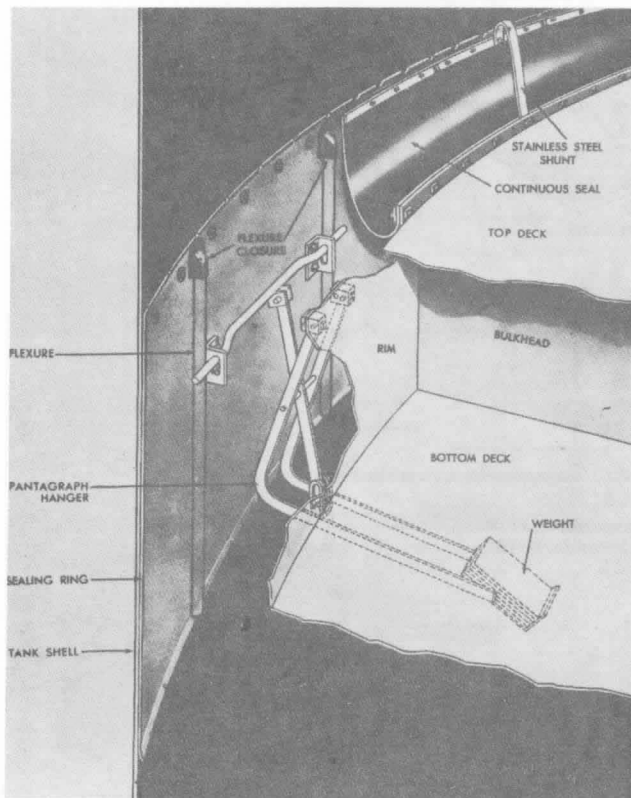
(a) Pantograph-type Seal Open-Top Floating Roof Tank.
